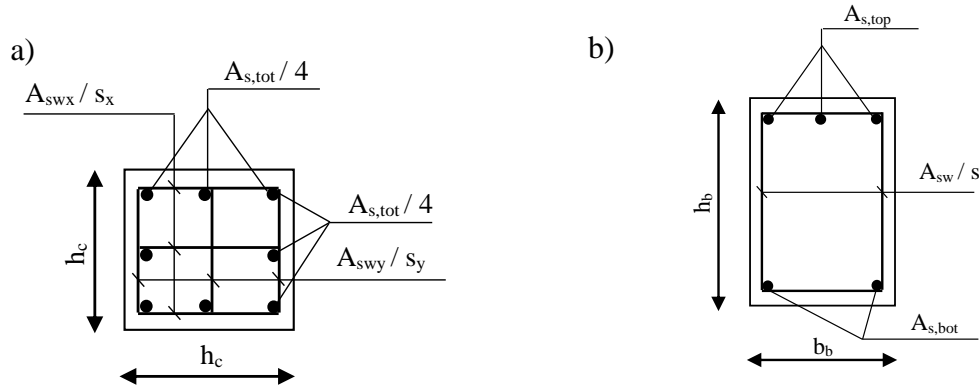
Concrete cross-sections and steel reinforcement configurations assumed for; a) columns; b) beams
